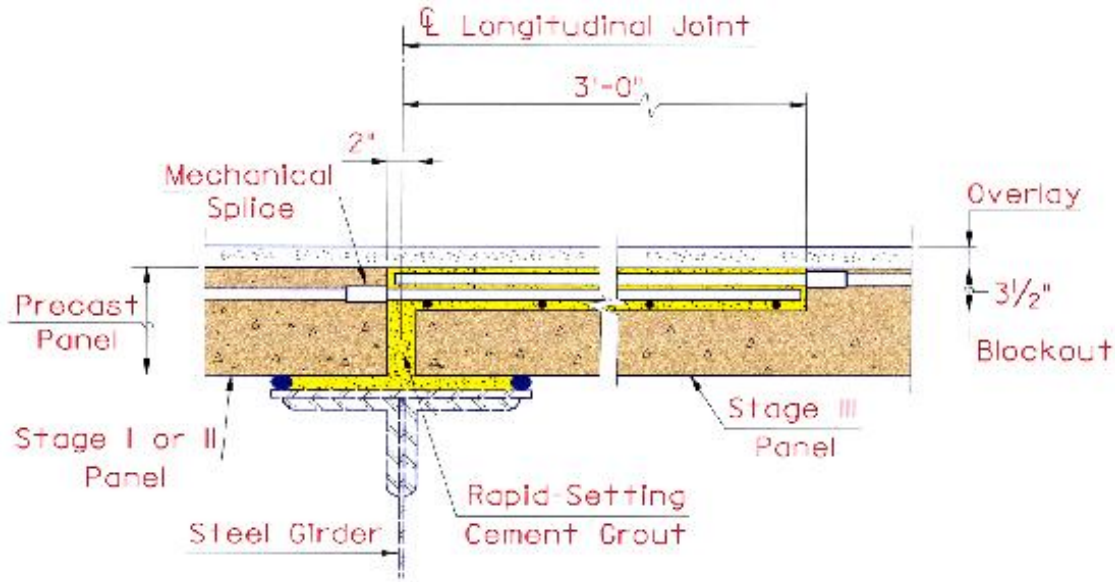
Longitudinal connection between Stage 3 and Stage 1 & 2
